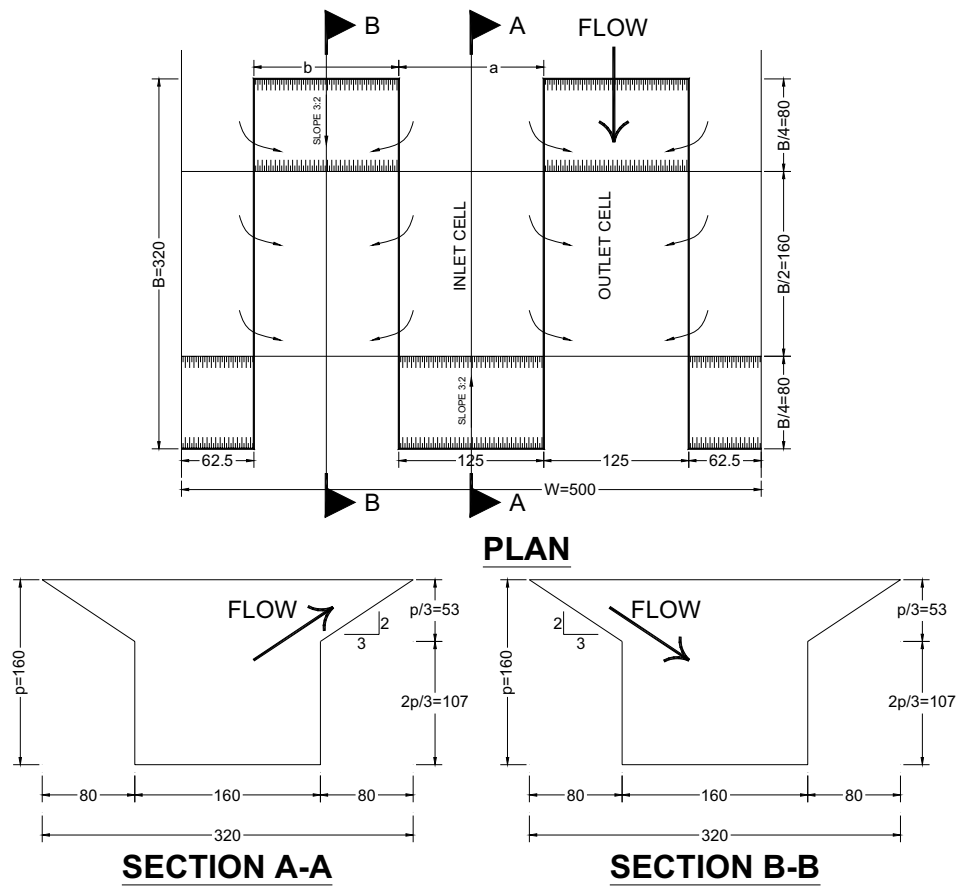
Plan and section of model P_1M_5 (dimensions in mm)
